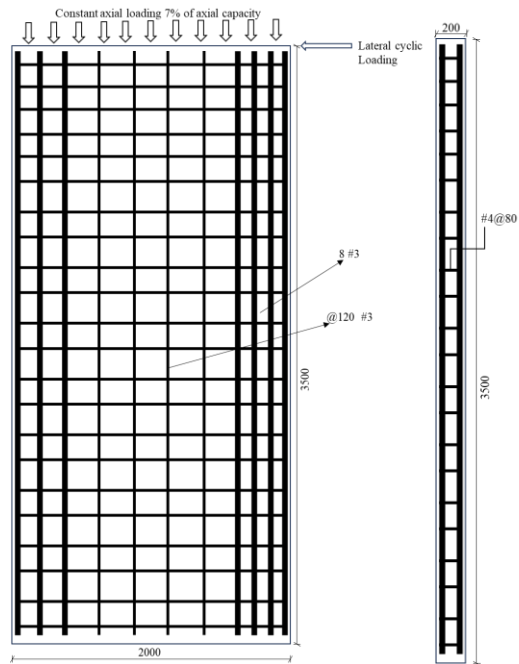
G-15 concrete dimensions and details of reinforcement configuration
